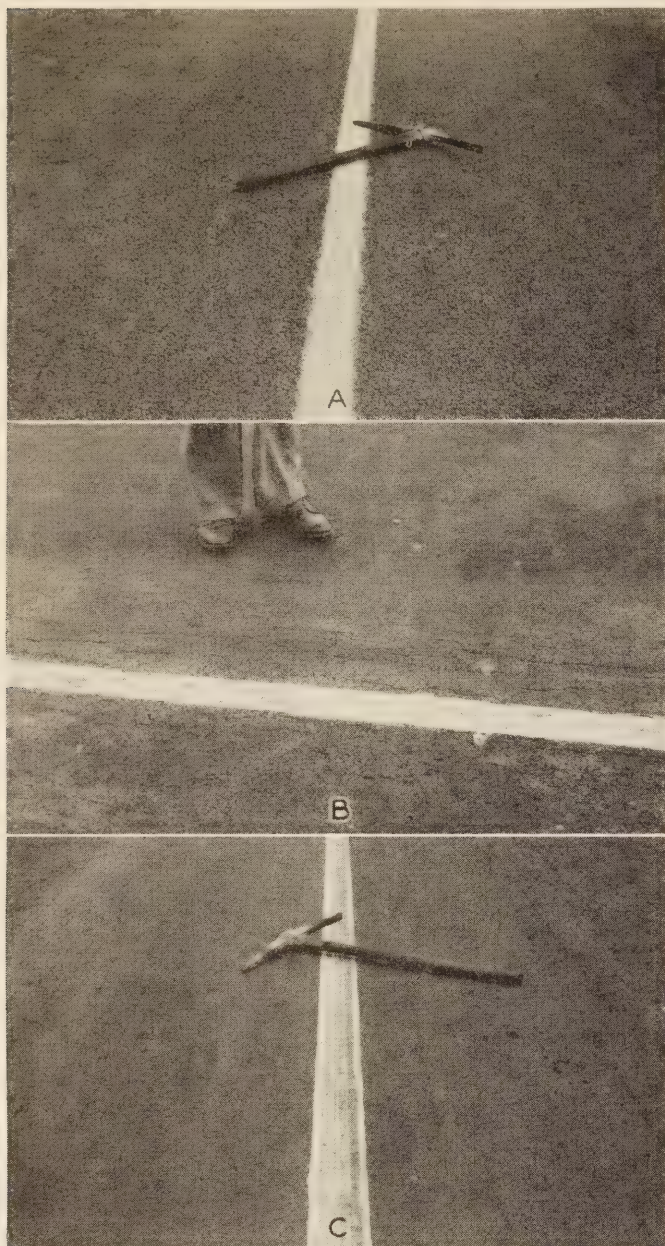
EIGHT YEARS AFTER CONSTRUCTION, (A) THE ORIGINAL SURFACING WAS STILL IN GOOD CONDITION ON SECTION 4, (B) THE 1940 RESURFACING ON SECTION 3 HAD CRACKED, AND (C) THE 1944 RESURFACING ON SECTION 2 WAS IN GOOD CONDITION.
